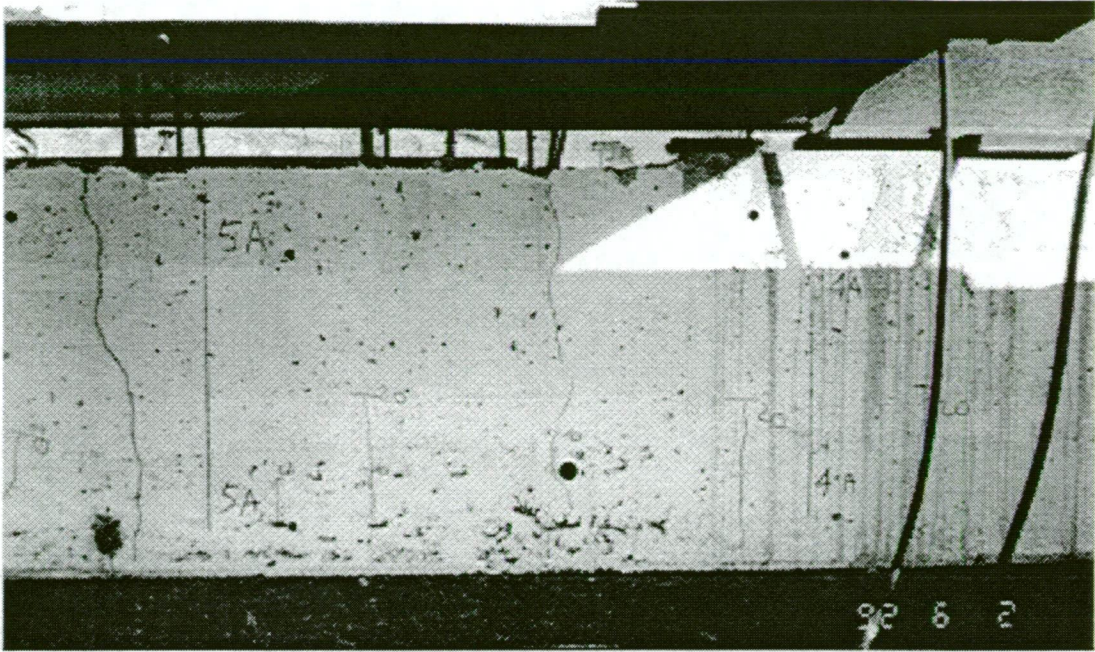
Flexural Beam Crack Patterns
